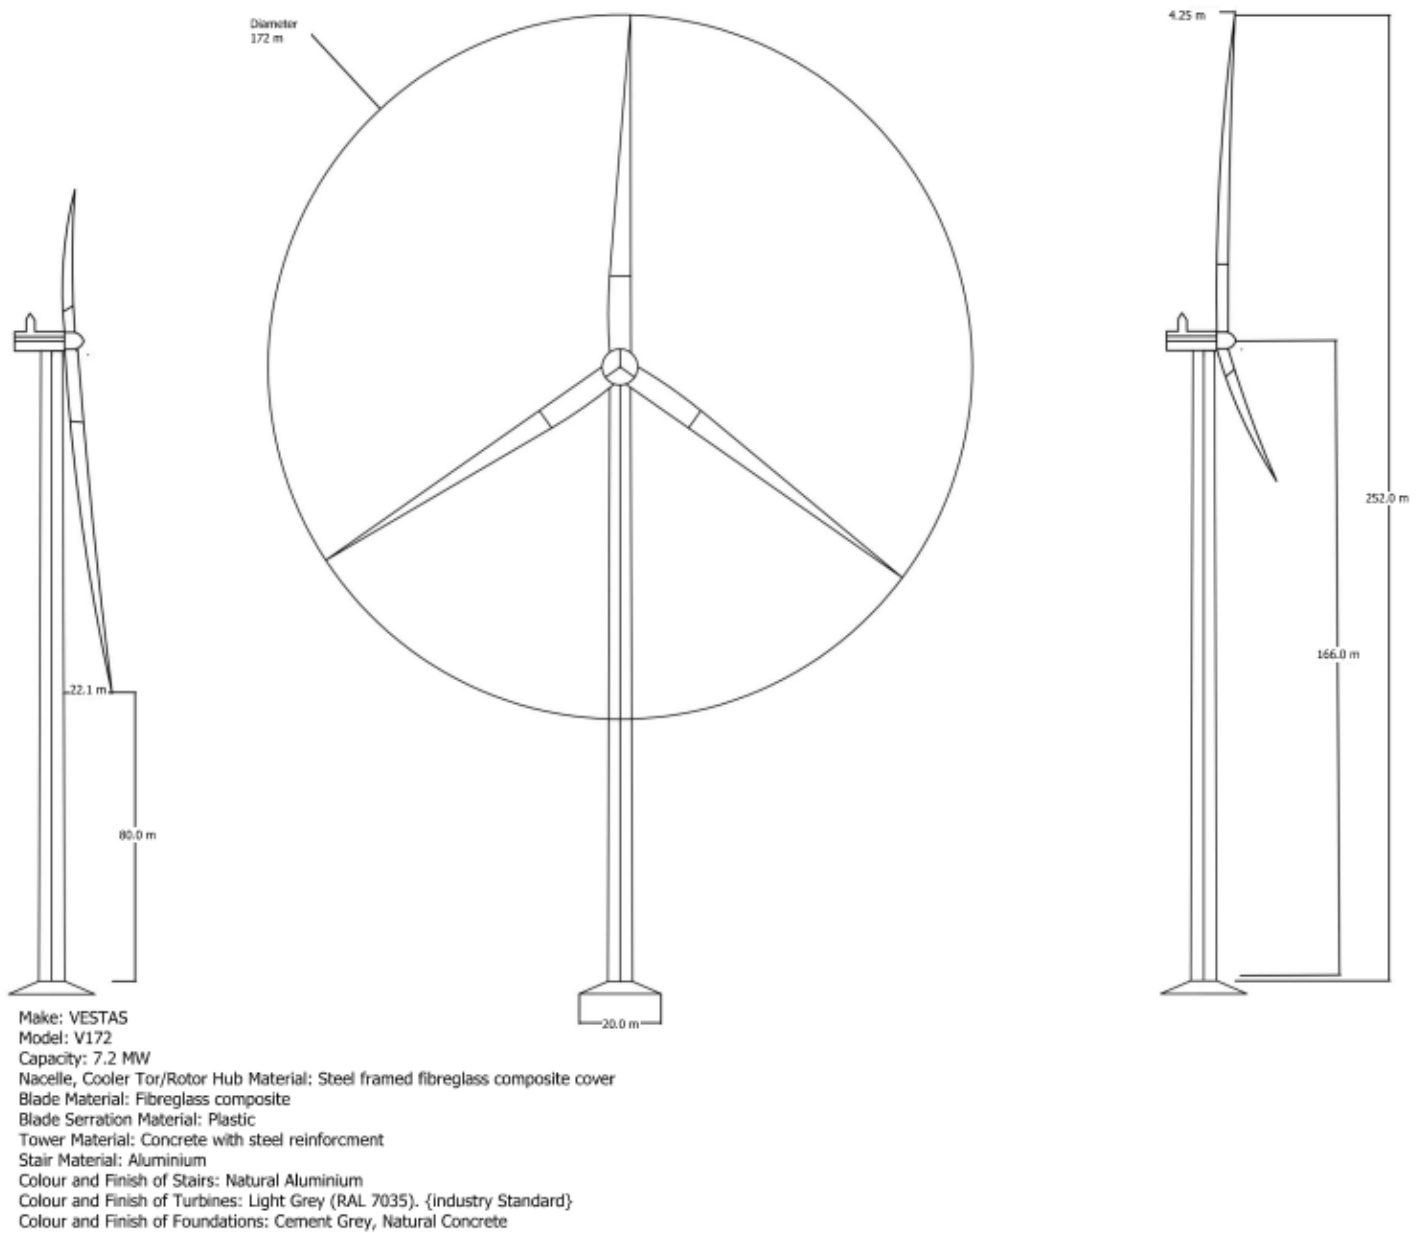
Elevation of proposed 172m diameter turbine model. Source: Advertised plans
